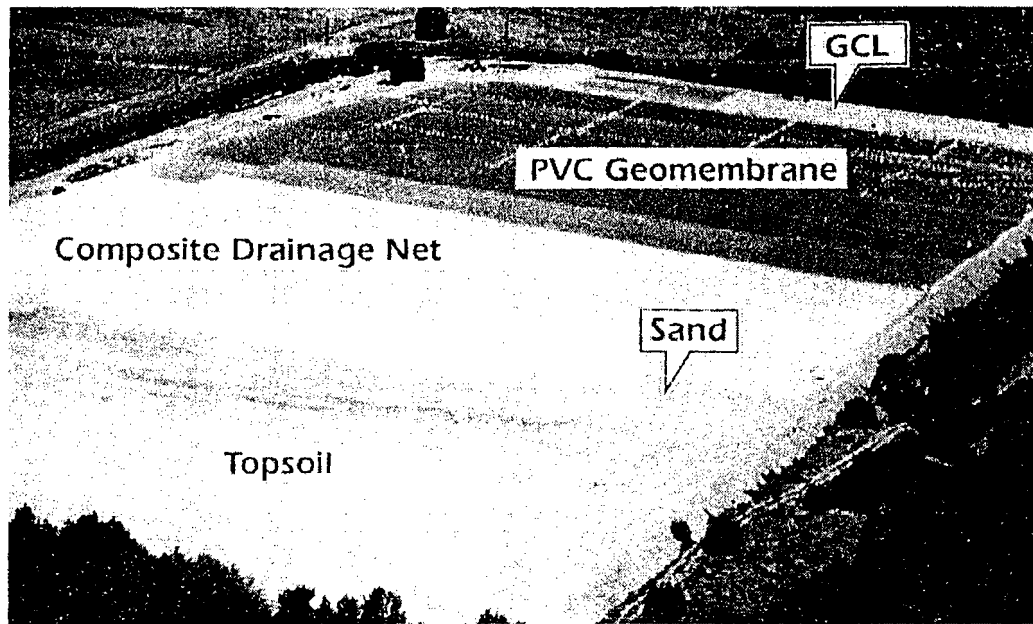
Cover under construction. From background to foreground, the GCL, geomembrane, composite drainage net, sand, and topsoil are visible.
